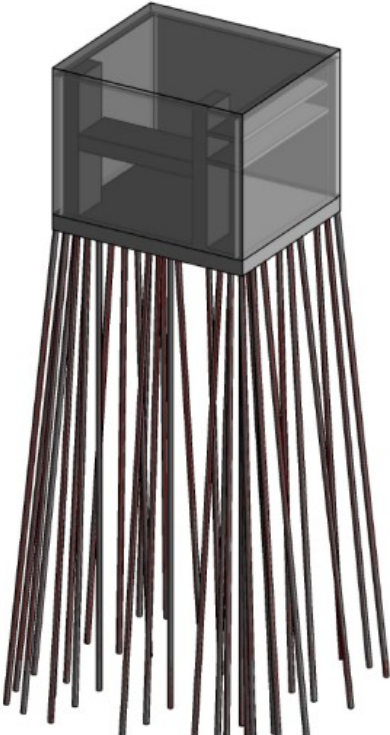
Foundation: 35 Tubex steel piles (Ø 609/850 mm, NAP -70 m); footprint 23 × 27 m [34]
